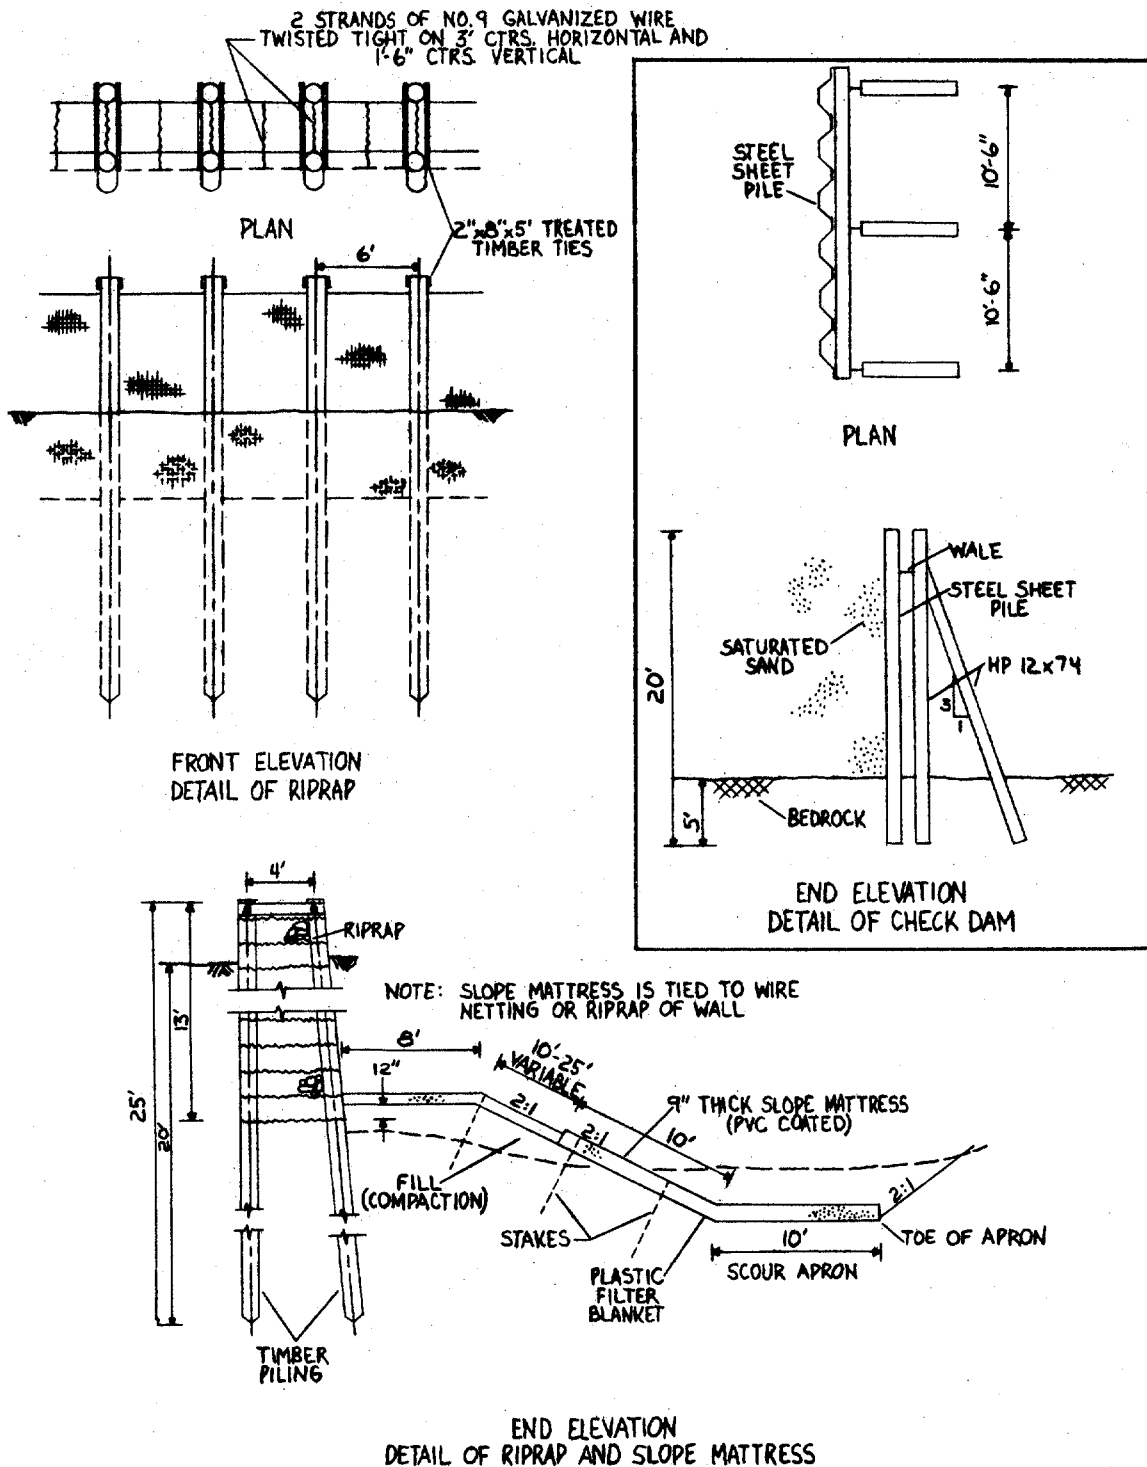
Details of bank protection and (inset) sheet-pile check dam.
